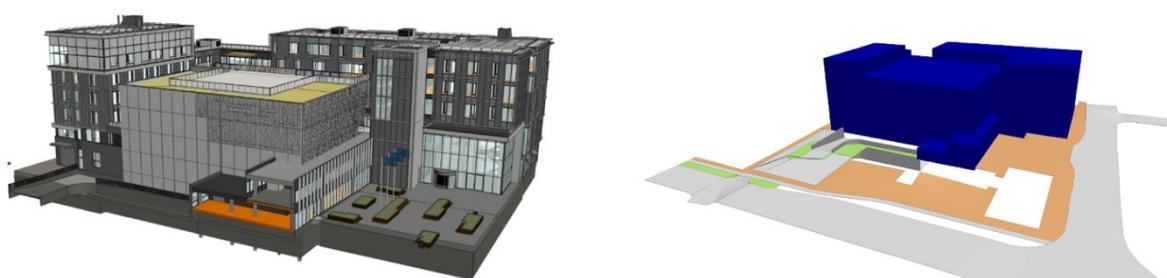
Example of a BIM model of building design (left) and a BIM model of a Detailed Plan (right).
